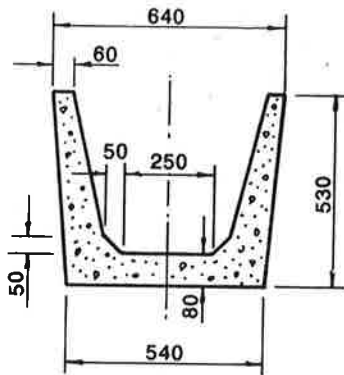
Precast Concrete Tertiary Canal Unit Used in Egypt.
